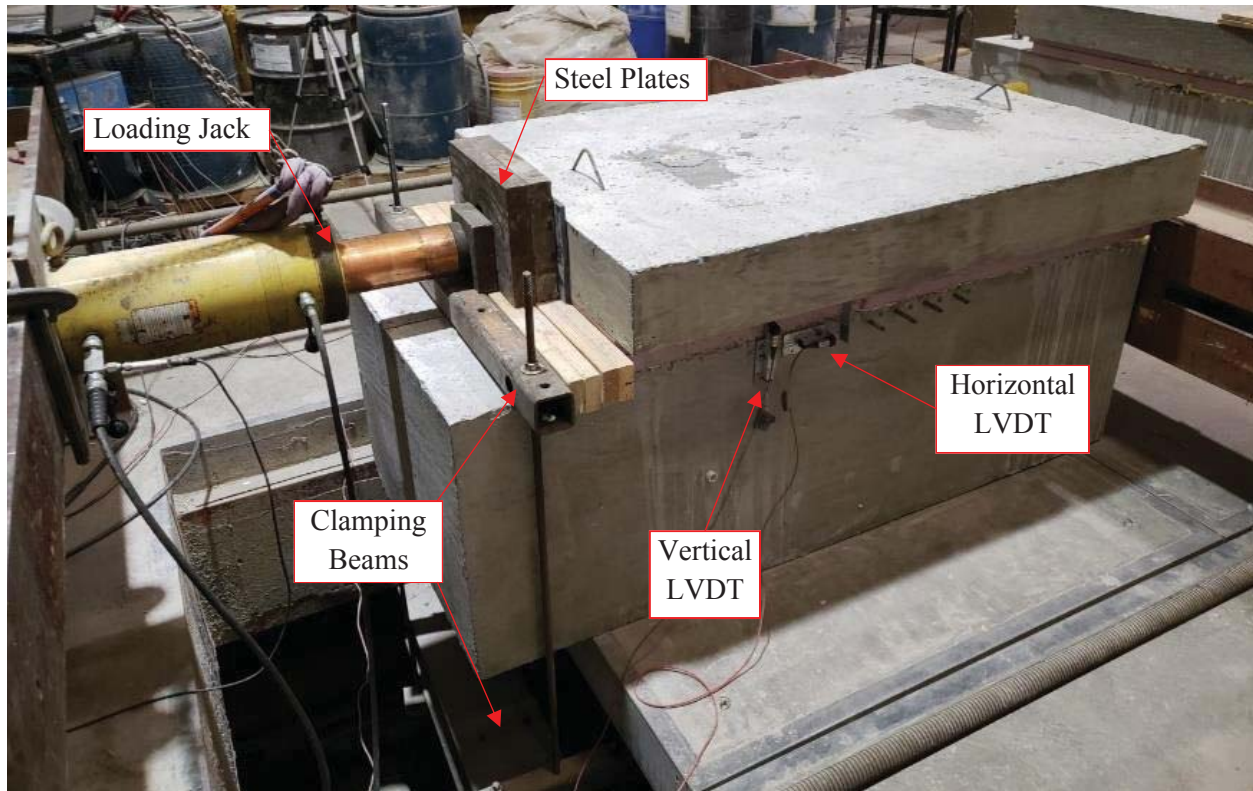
Full-Scale Push-Off Specimen Test Setup.
